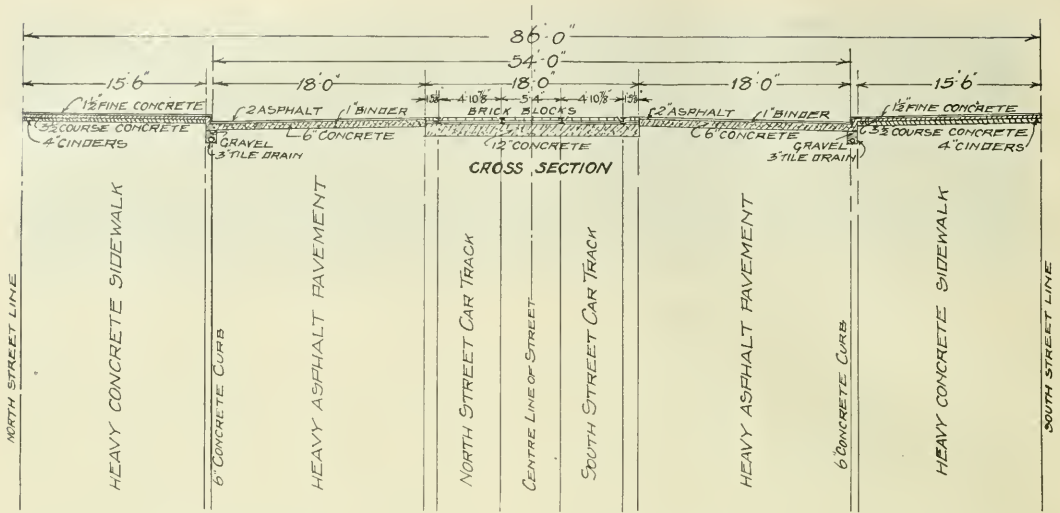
City of Toronto municipal street railway lines—Section of Danforth avenue roadway.
